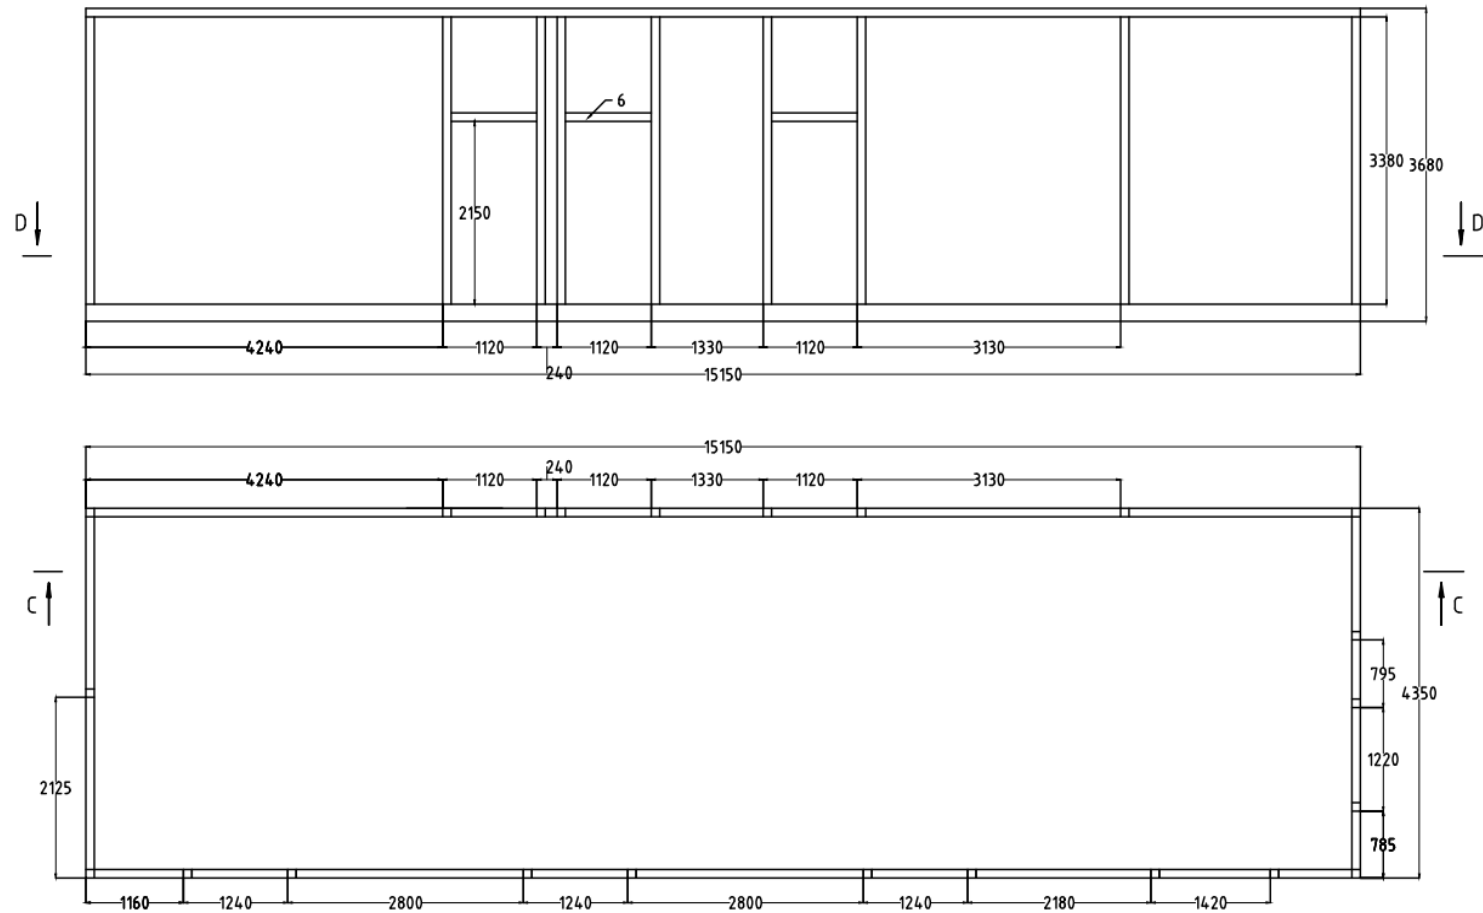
is a technical drawing of a window frame assembly. It shows a cross-section of the frame with various dimensions and components labeled. The overall width is 4350, and the overall height is 3680. The frame is divided into three main vertical sections. The left section has a width of 795. The middle section has a width of 1220. The right section has a width of 785. The height of the frame is 3680. The frame is composed of several parts, including a main frame (2), a window pane (4), and a window pane (7). The window pane (4) is shown in the center, and the window pane (7) is shown to its right. The dimensions are given in millimeters.
